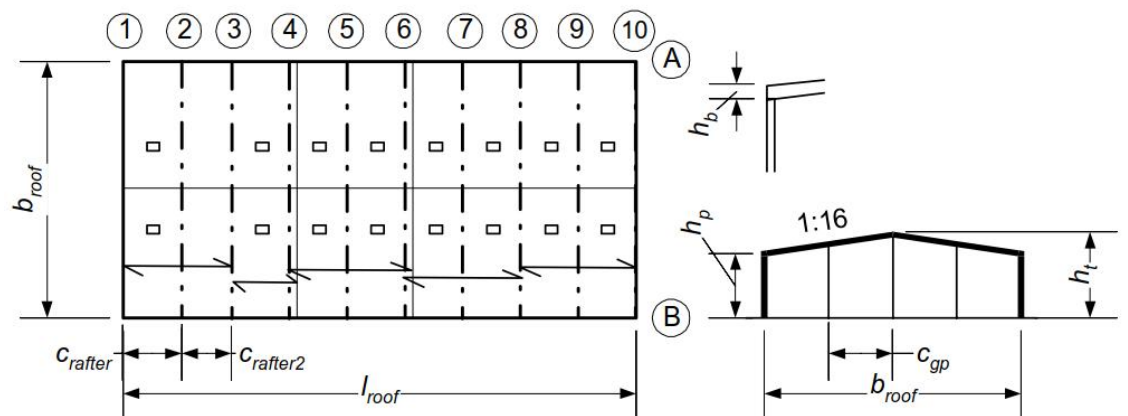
Building with roof sheets on rafters (Höglund, 2002)
